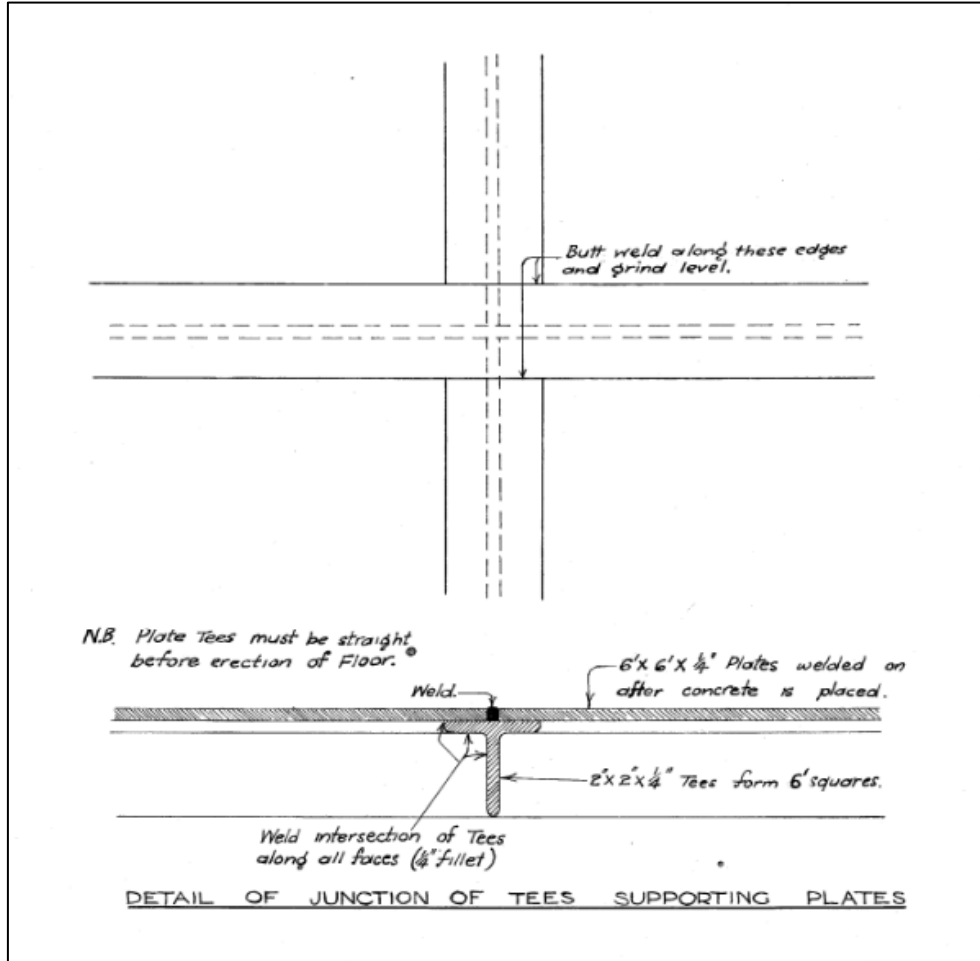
Weld detail between horizontal tees in base slab and steel plate
